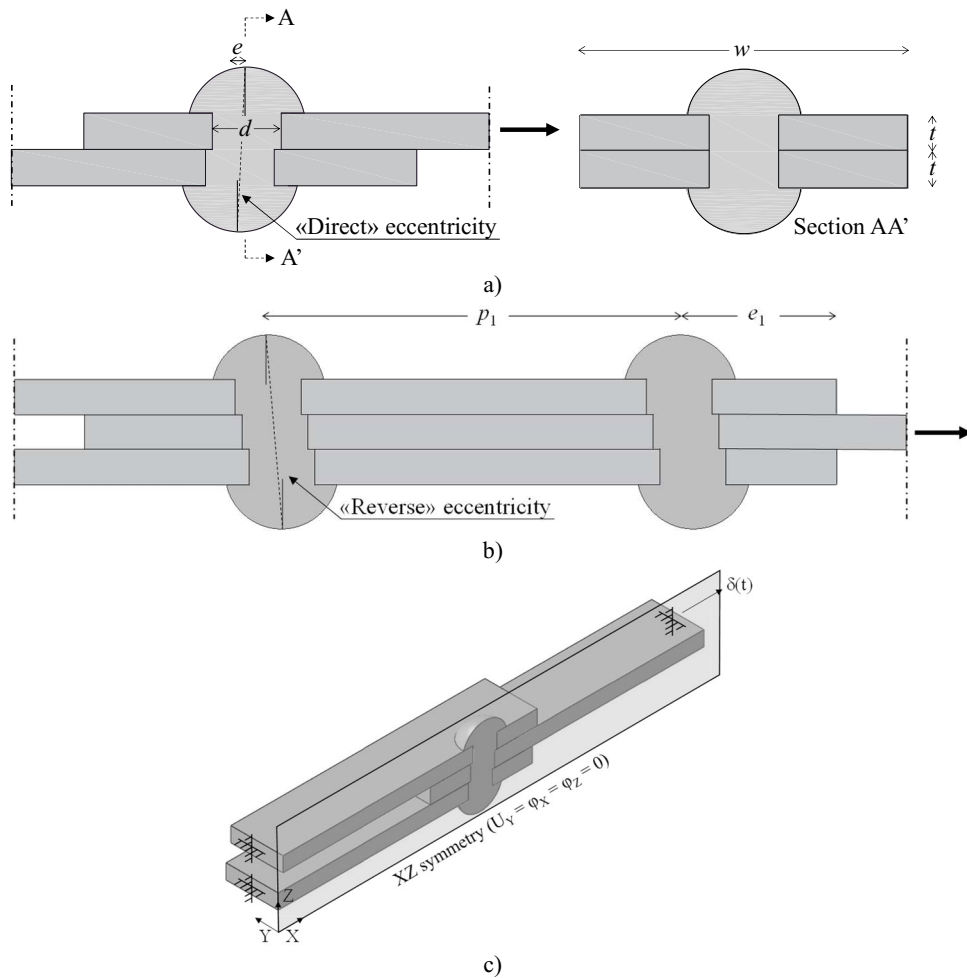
Main features for the investigated connections: a) single rivet specimens, b) double rivet specimens, c) modification of BCs for distorted symmetric specimens.
